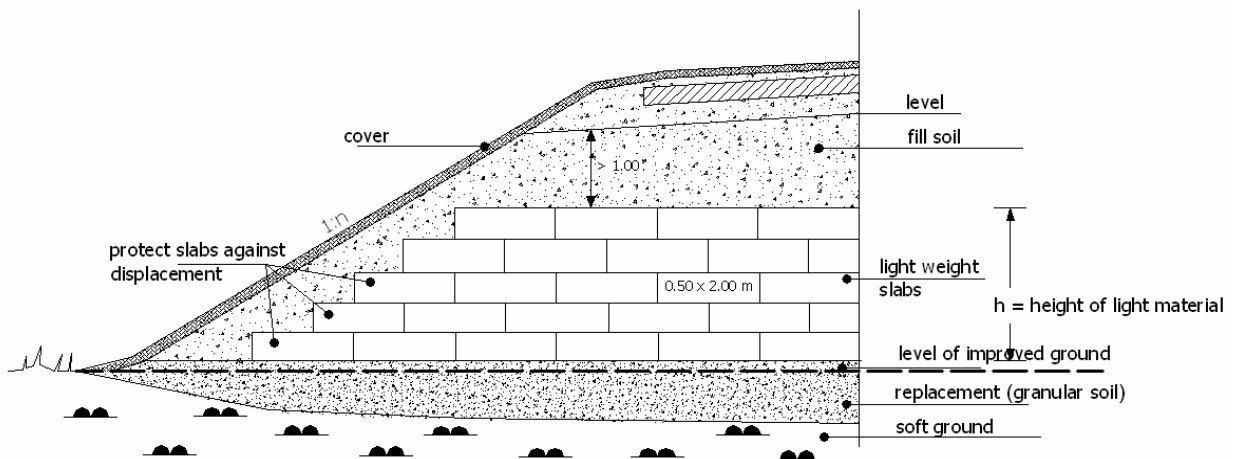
Example of constructing embankment by using slabs of extruded polystyrene.
